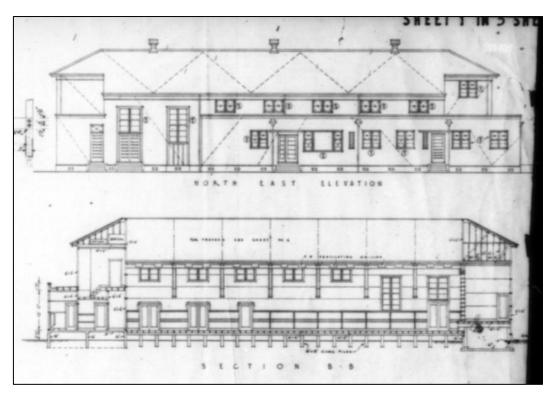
Extract from fig. 103 above. 'North-East Elevation' and 'Section B-B' for 'RNZAF Station Hobsonville Institute Building'. This elevation would be the west elevation at Hobsonville, reversed about the y-axis.
